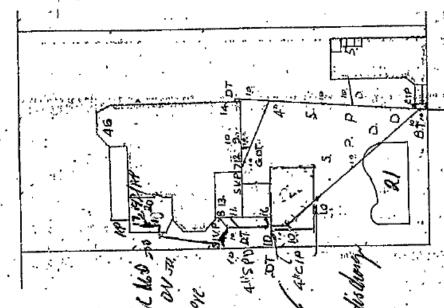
MMBW drainage plan showing the footprint of the house, c.1990s. The plan shows an addition at the south-west corner of the house and additions to the rear (Yarra Valley Water)
